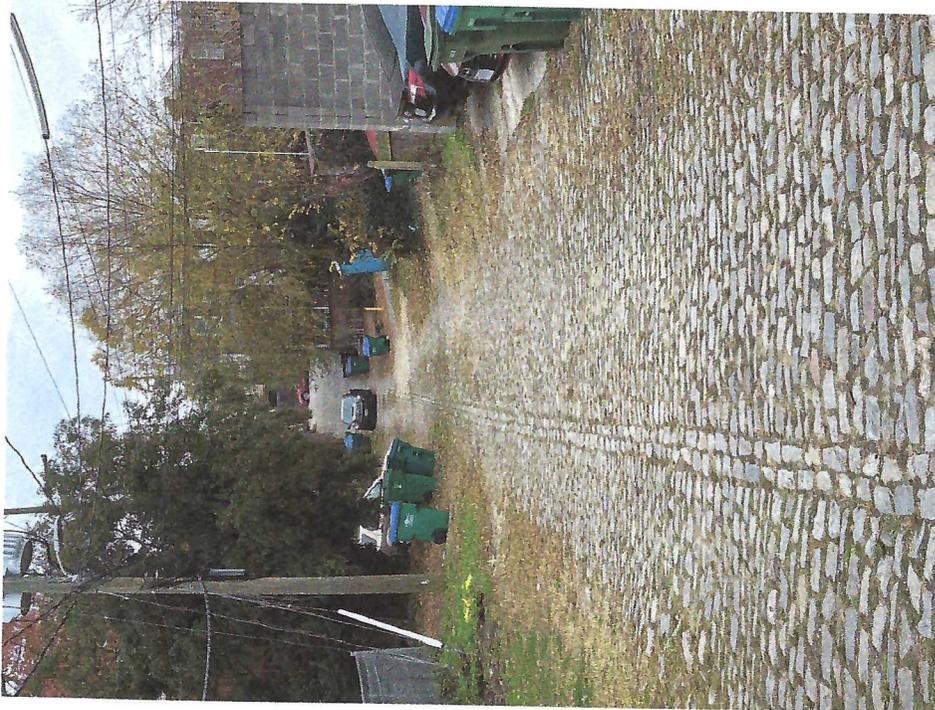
North end of alley on the east side 2811 E Marshall St cmu garage w/o roof looking south
